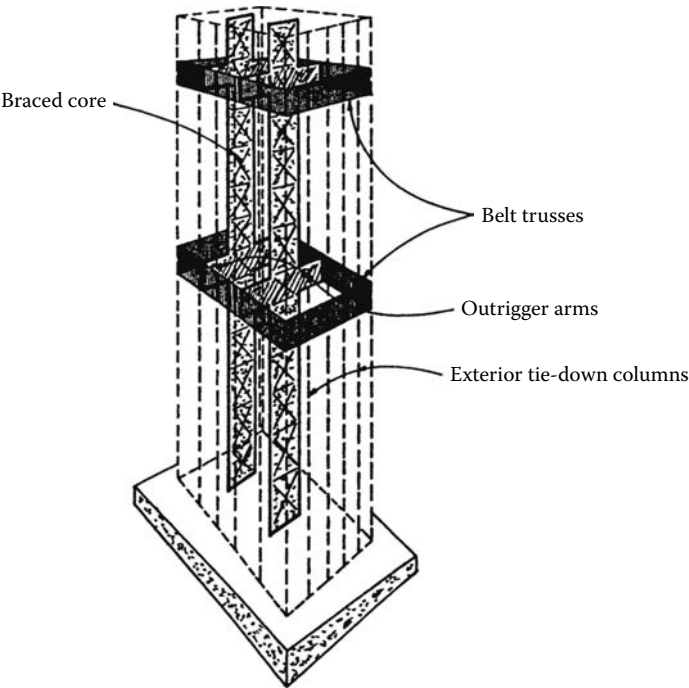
Structural schematics; building with outrigger and belt walls at two locations.
